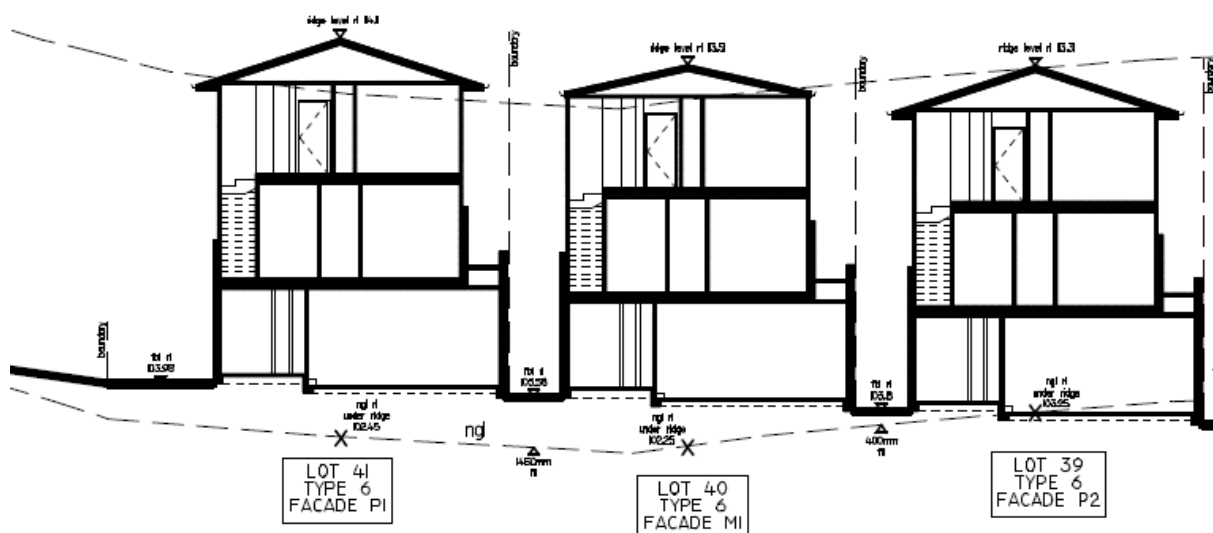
Section of Lots/ Dwellings 39-41 including height plane
